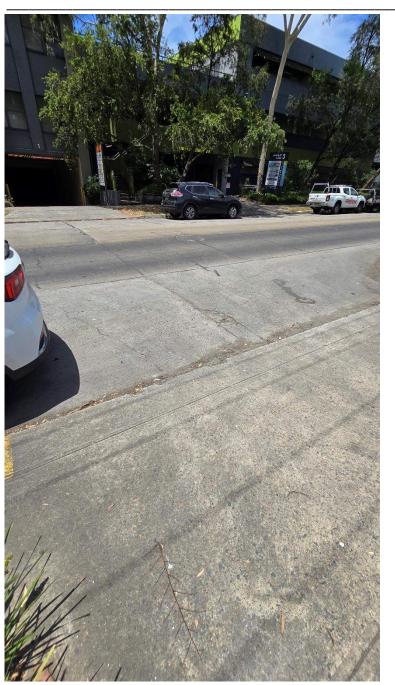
Cracks observed (25, 26, 27) - Road in poor condition, cracks and repairs observed throughout
